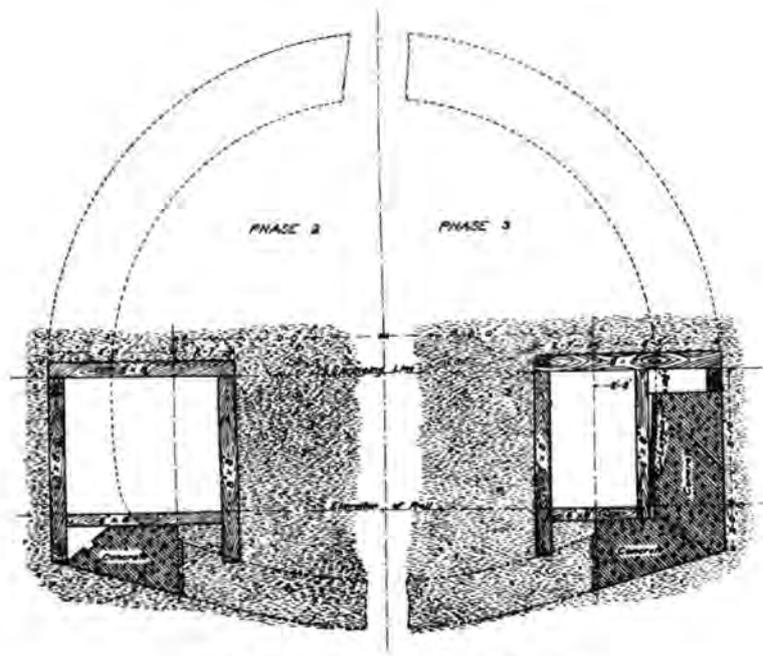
UNDERGROUND RAILWAY, BOSTON, U.S.A.
